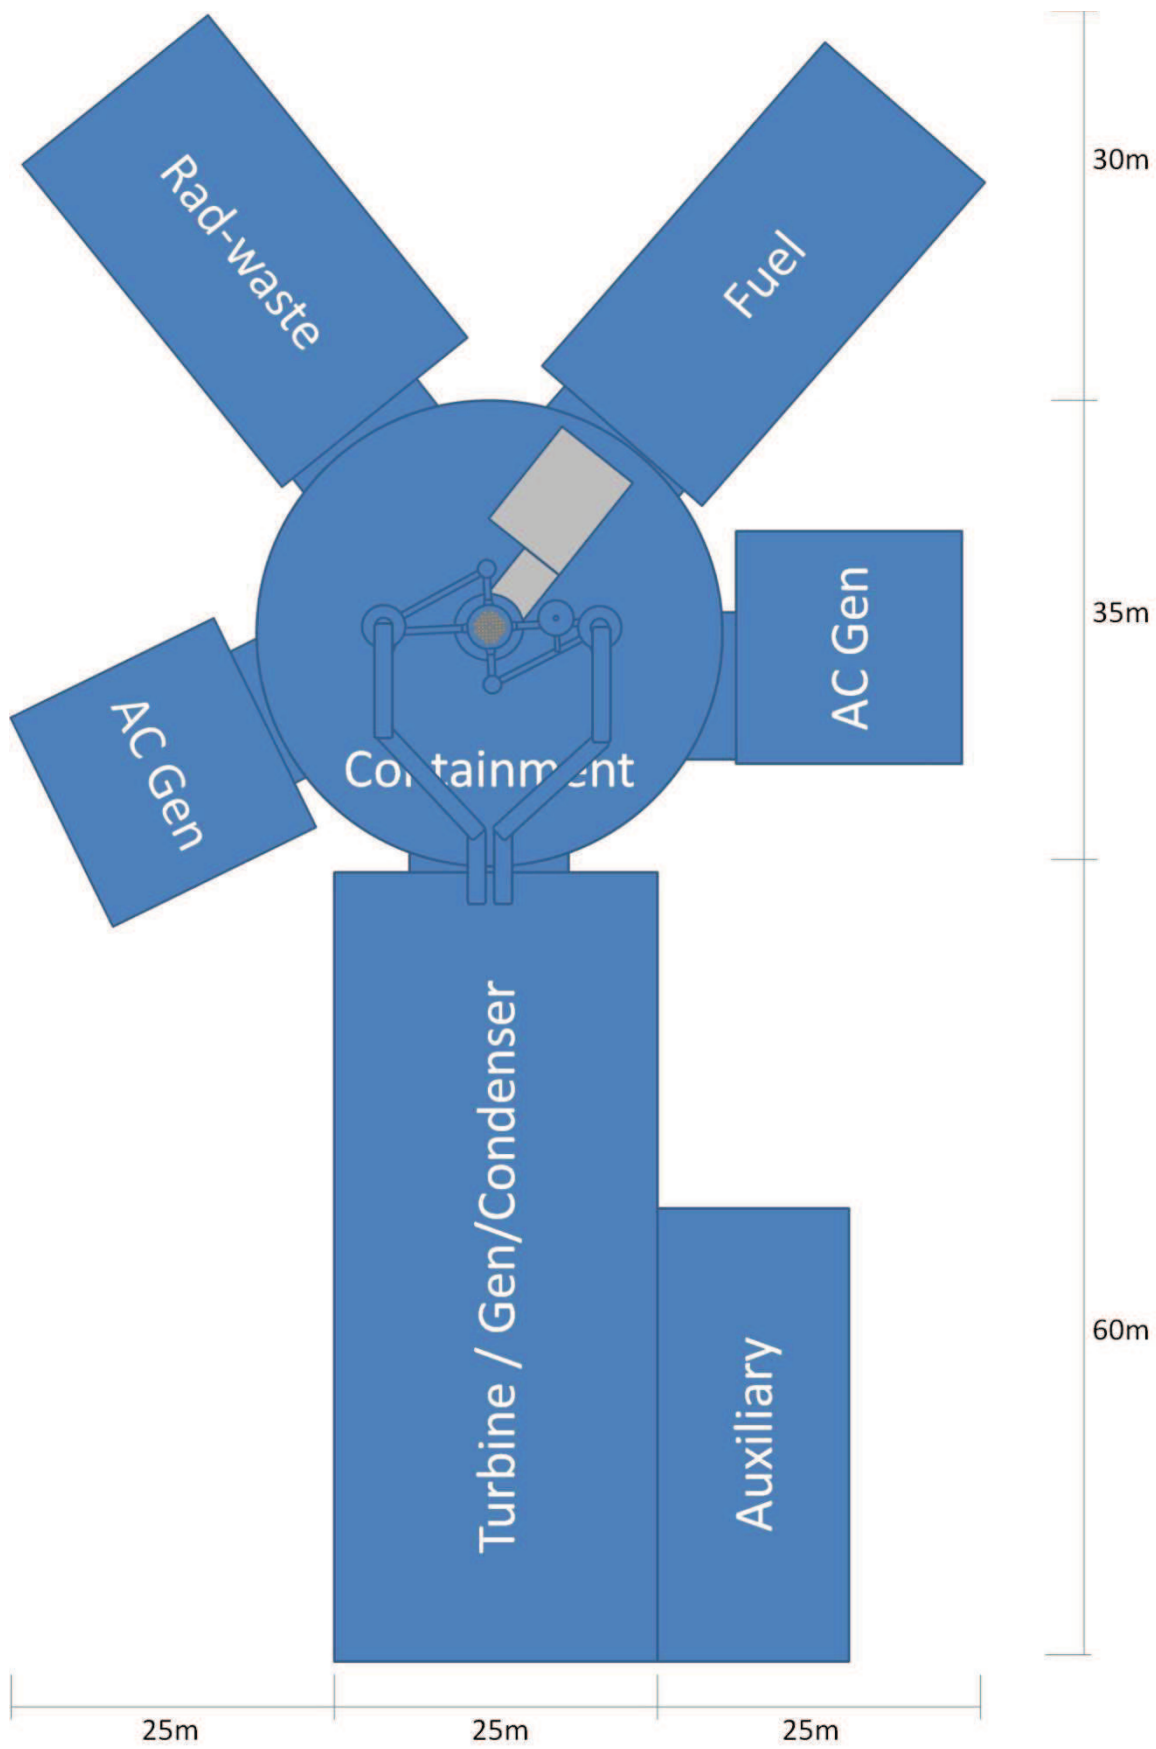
Top down site plan showing the layout of the constituent buildings for a single unit of the proposed design.
